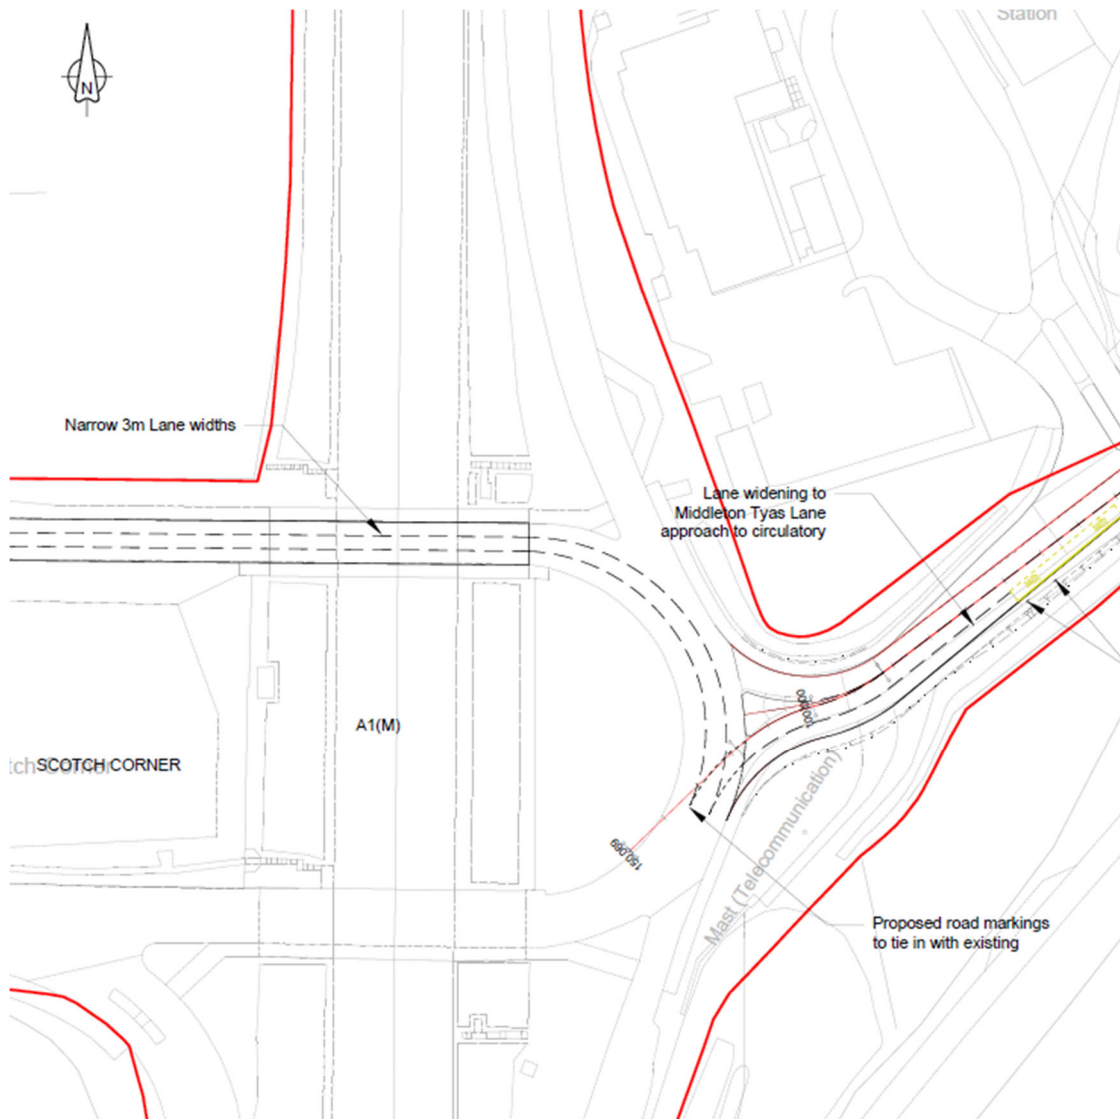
A1(M) Jnc 53 Scotch Corner scheme design
